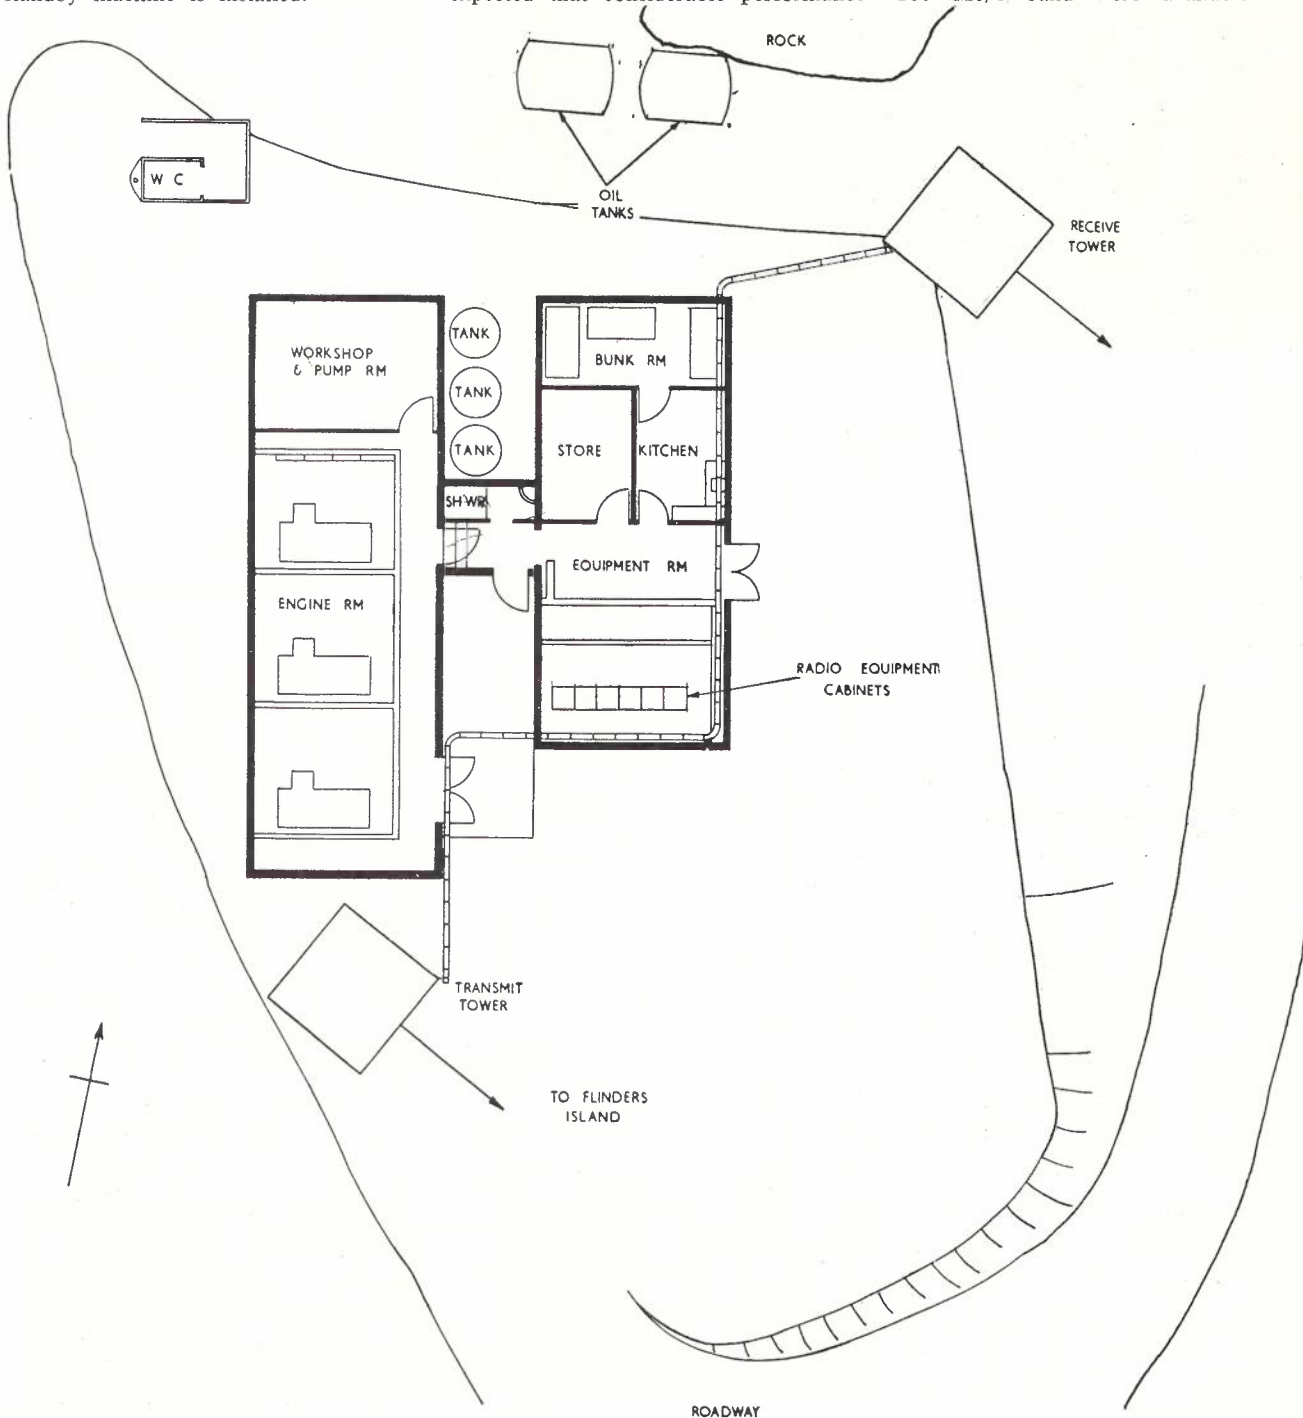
Mt. Oberon Radio Station—Site Plan.
